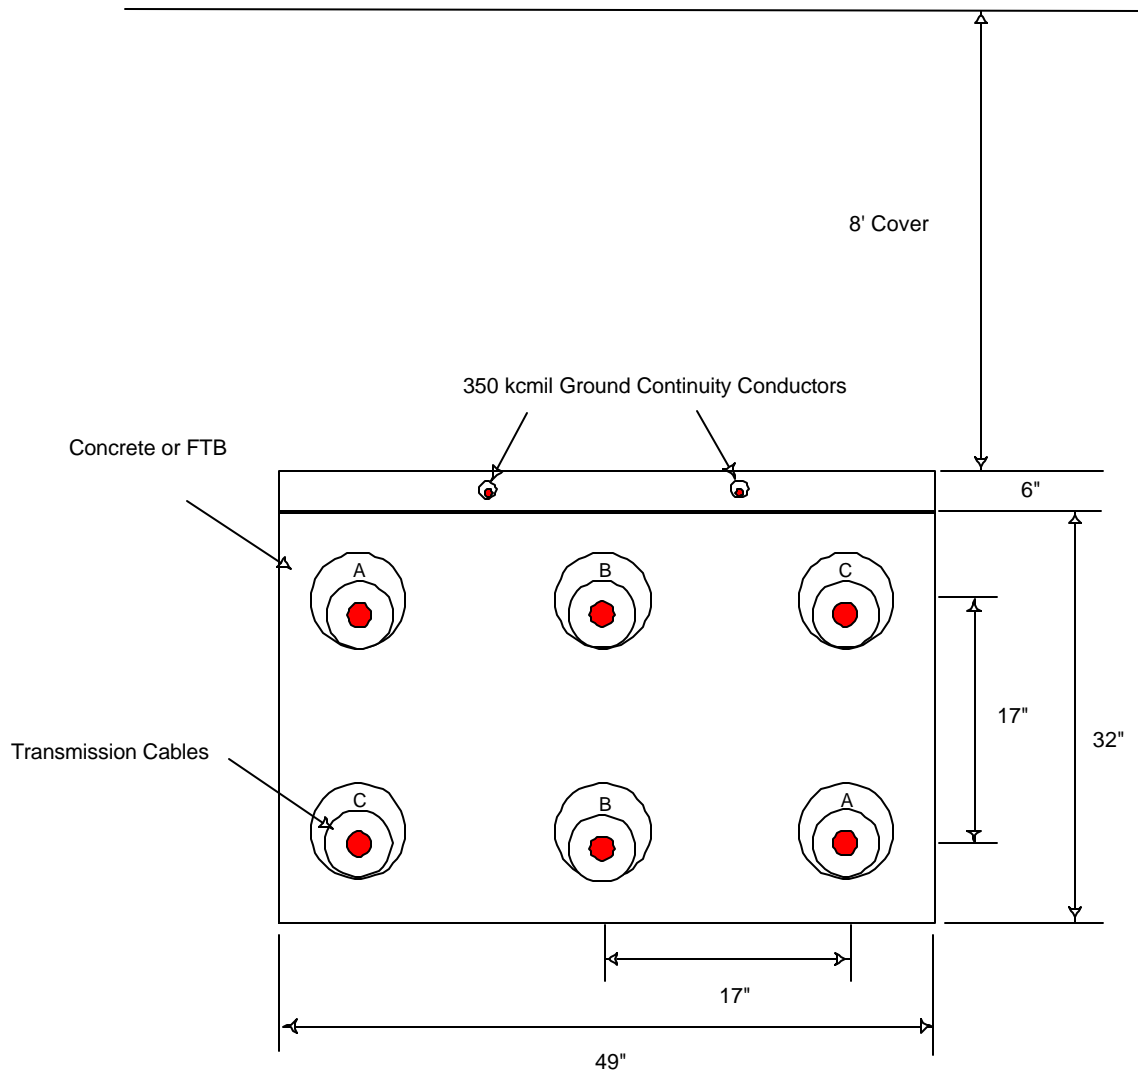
Concrete Encased Duct Bank Cross Section, 8' Duct Bank Cover
